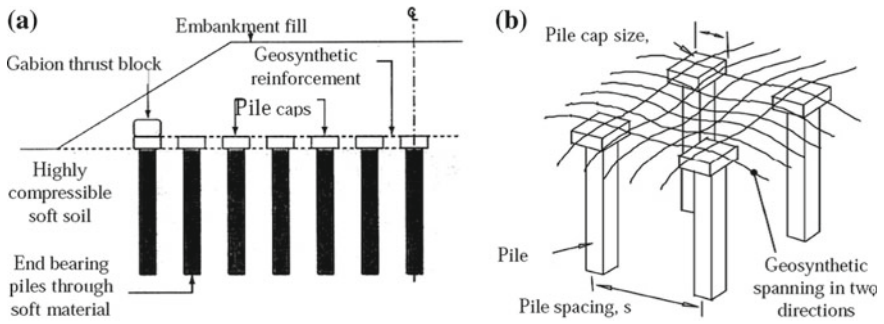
a Section of a piled embankment, b general layout of reinforcement in piled embankment
